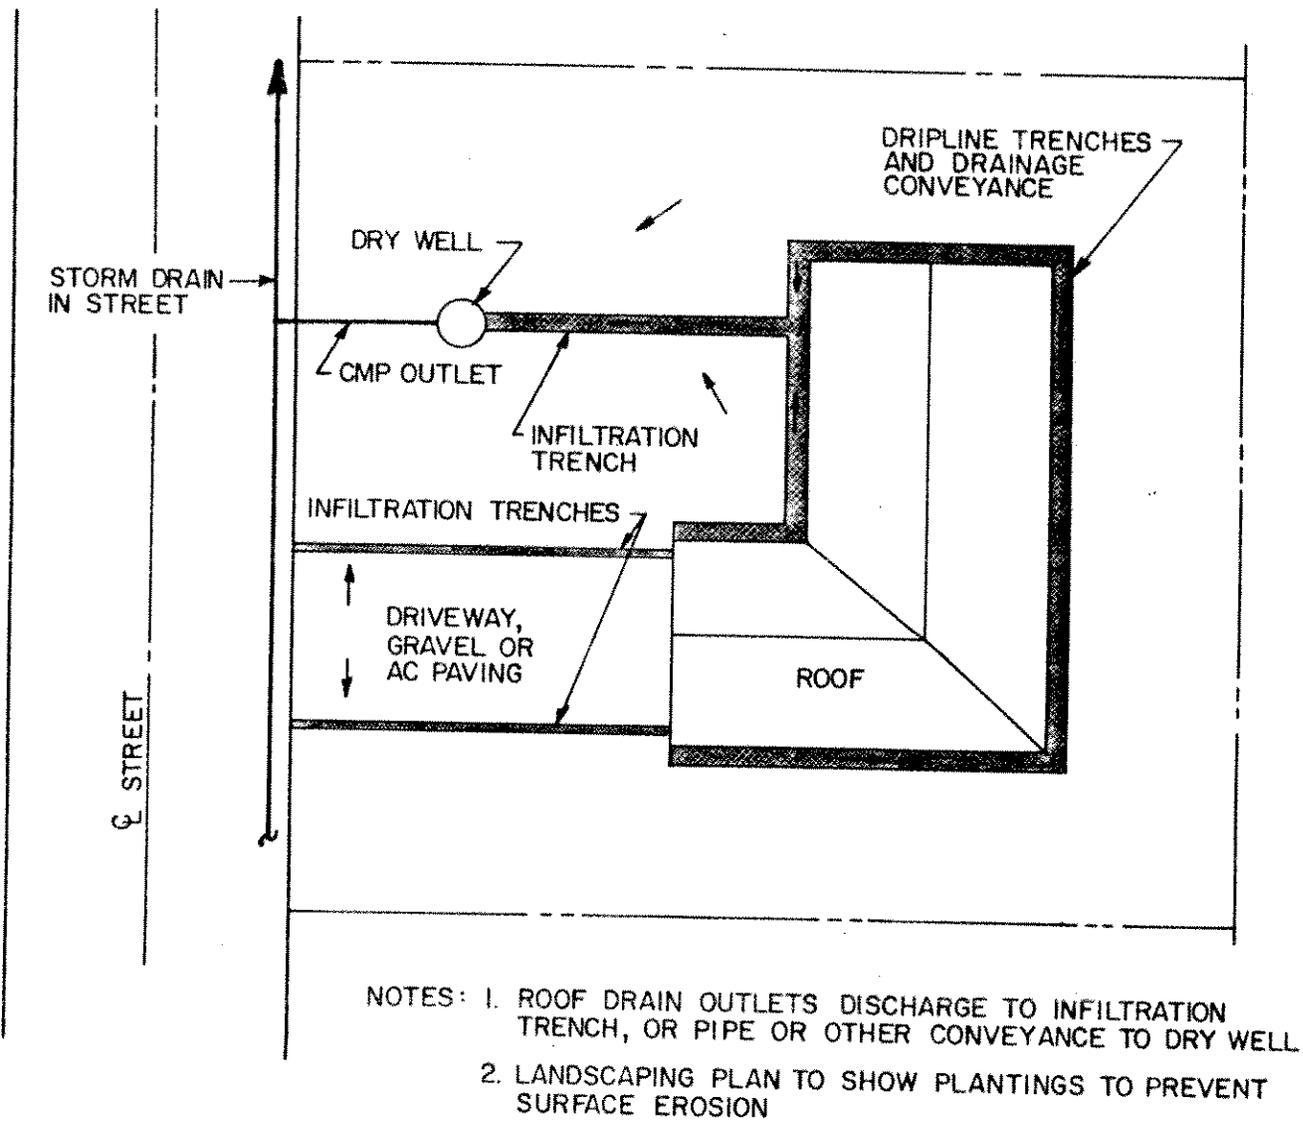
Typical Residential On-Site Storm Drainage Retention Facilities
